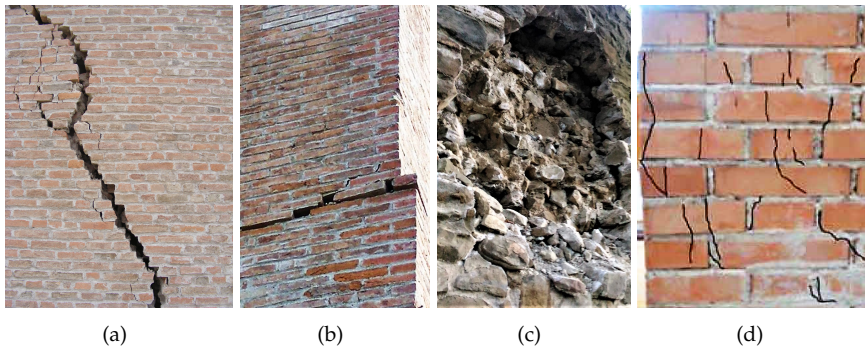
Masonry failure mechanisms (at a structural scale): (a) diagonal cracking, (b) sliding, (c) crumbling, and (d) crushing (from [12]).
